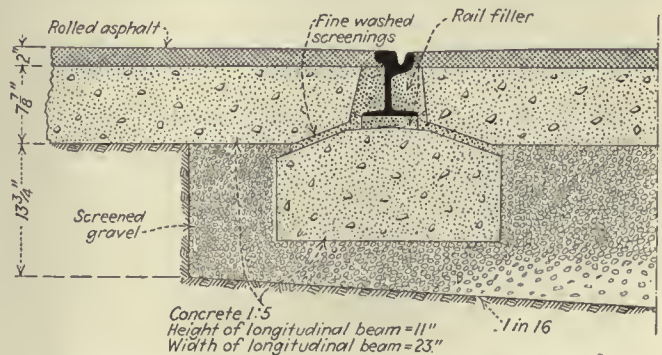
In standard tangent track construction, the rail is supported by an elastic filler on a longitudinal concrete base
